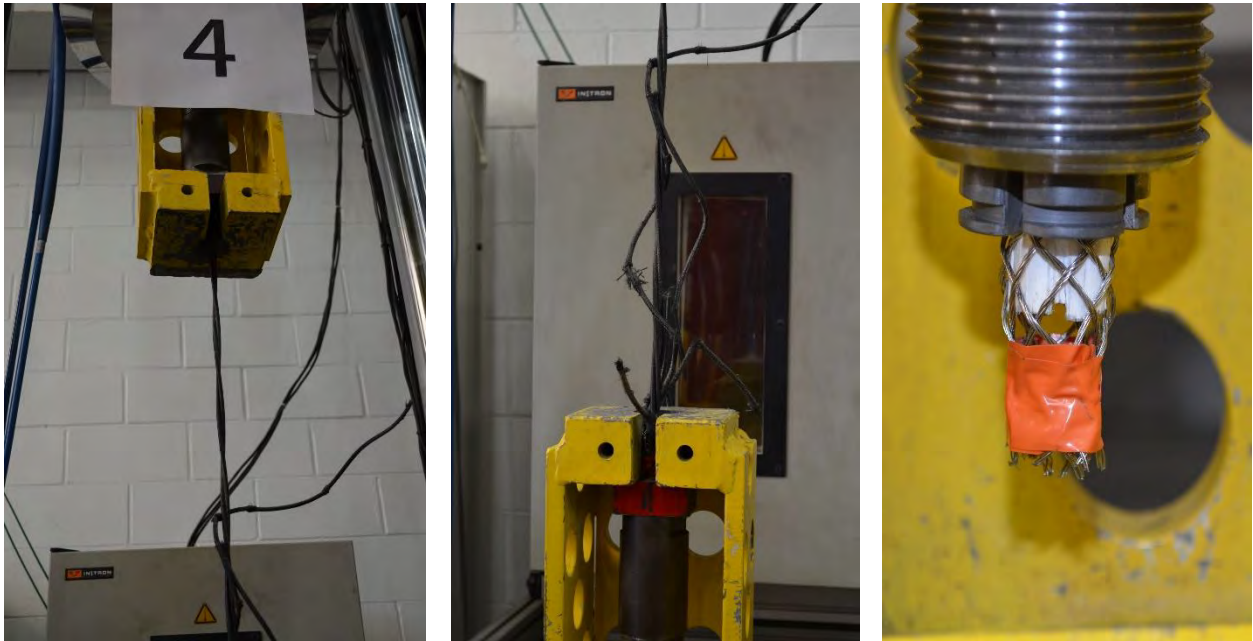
Failure of test specimens with wedge anchorage devices
